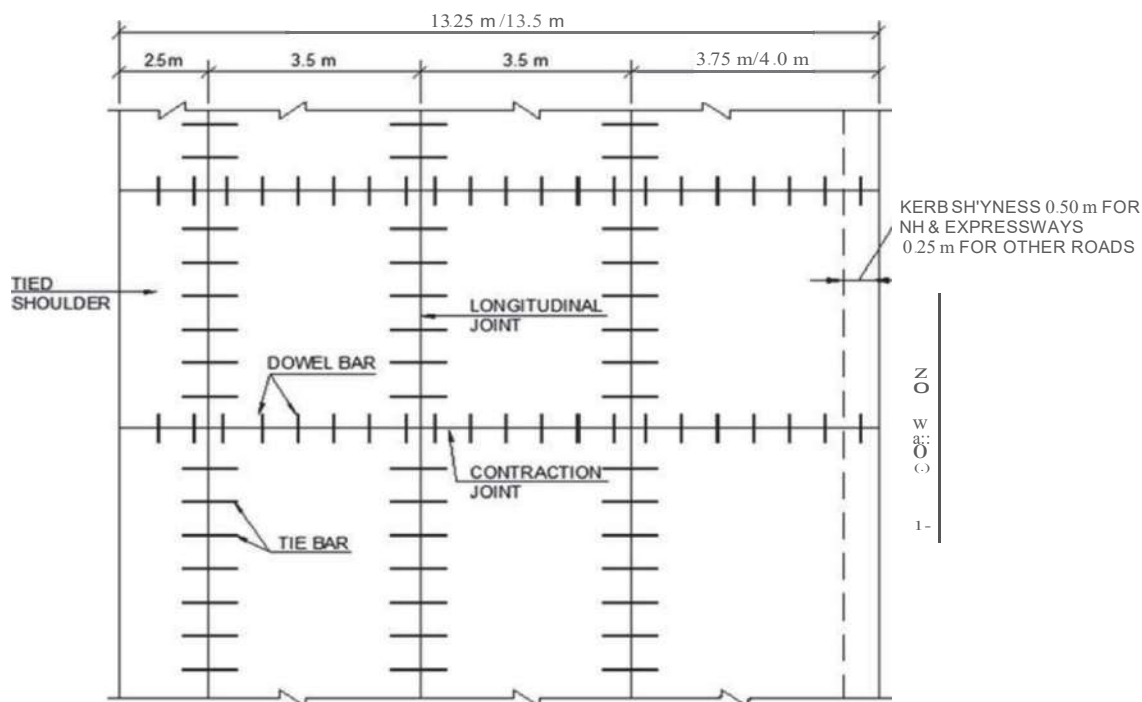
Joints Configuration for each Carriageway of Six Lane Divided Road With Tied Shoulder (Half Cross-Section)
